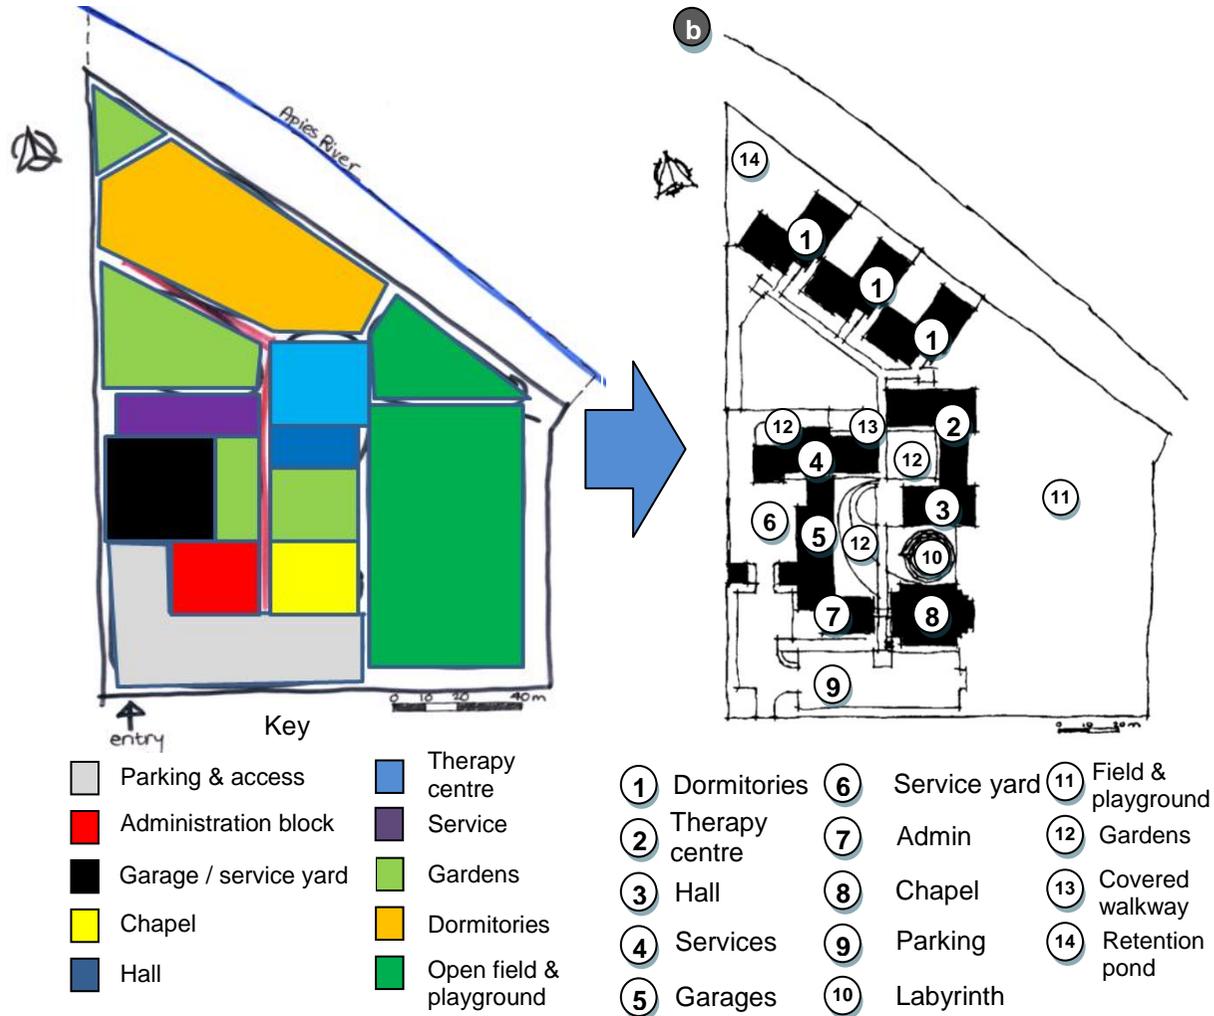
Site plans showing (a) initial rough layout (b) final site layout design
